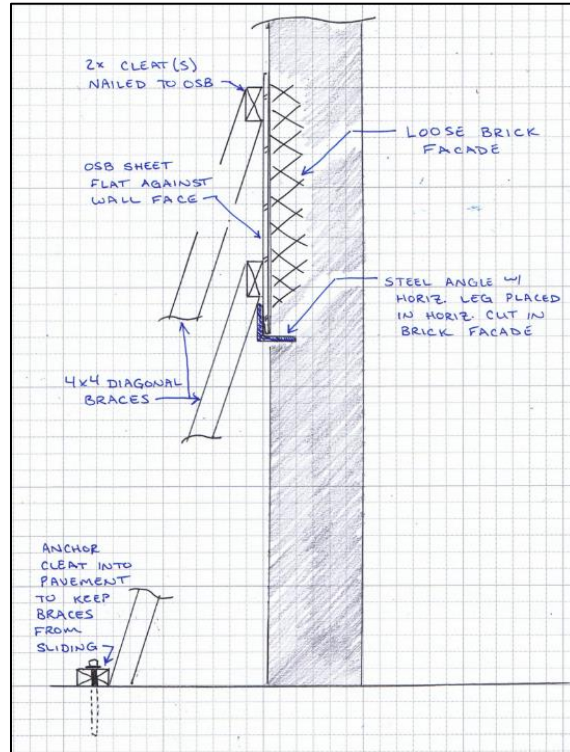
Temporary Brick Façade Detail (from 02/09/2023)
